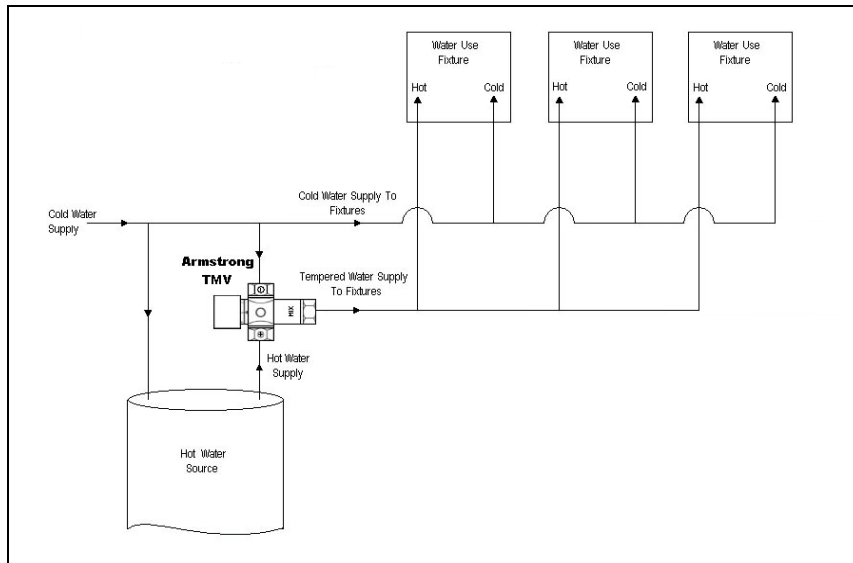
Typical Domestic Hot Water Installation without Recirculation
